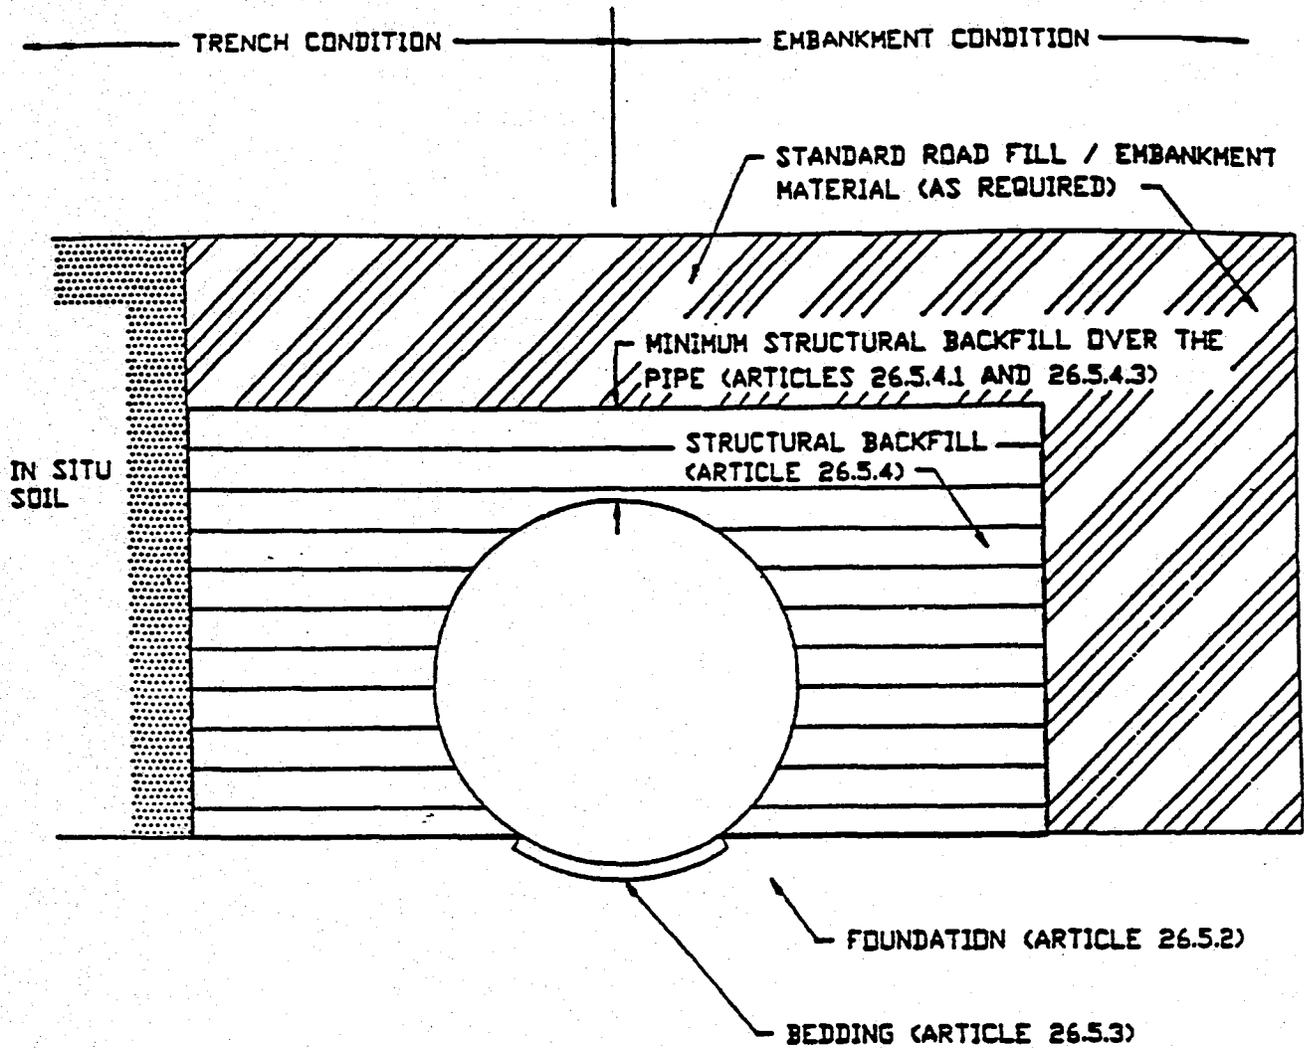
Typical Cross-Section Showing Materials Around the Pipe
